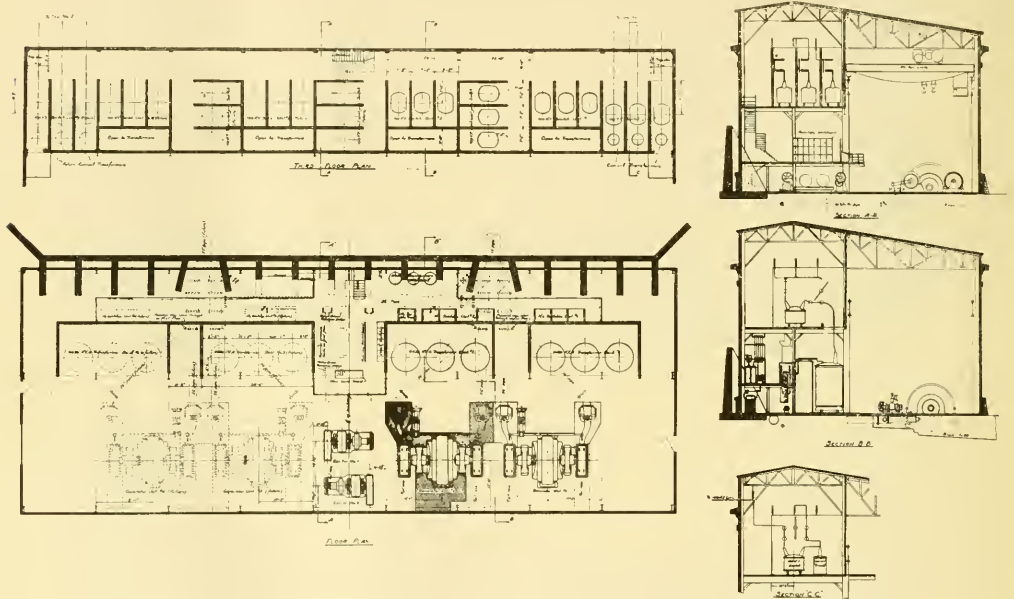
DETAILS OF THE DRUM POWER HOUSE, SHOWING ARRANGEMENT OF EQUIPMENT
